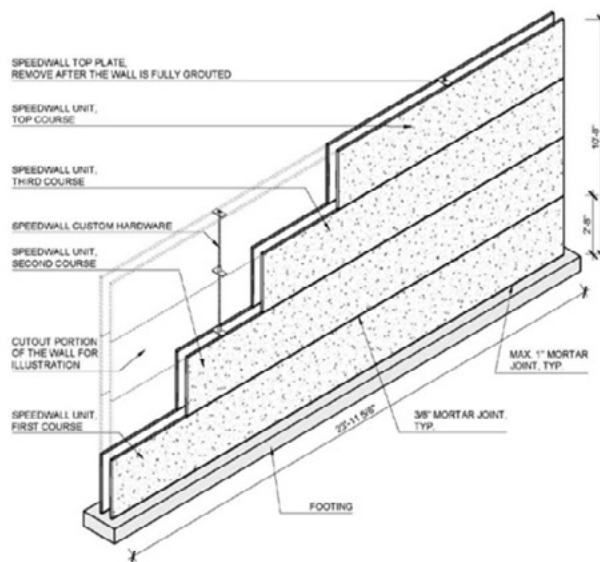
SPEEDBLOCK WALL ASSEMBLY INSTALLATION (1 in.=25.4 mm)
